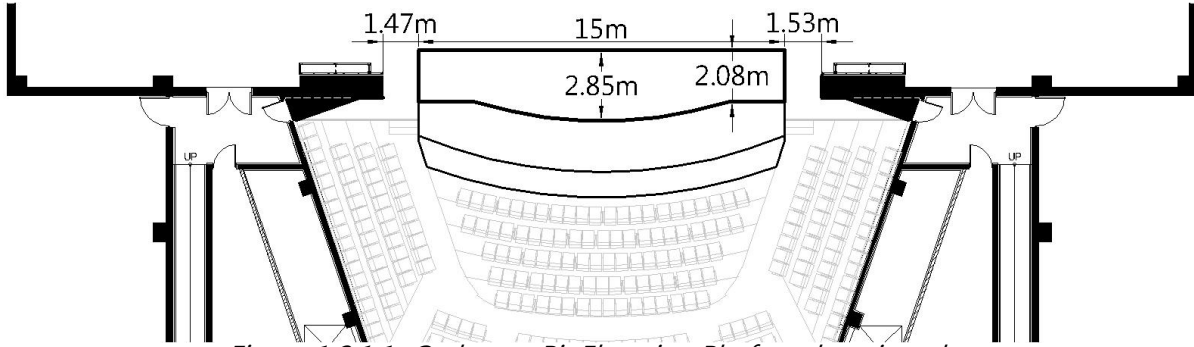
Orchestra Pit Elevation Platform location plan
